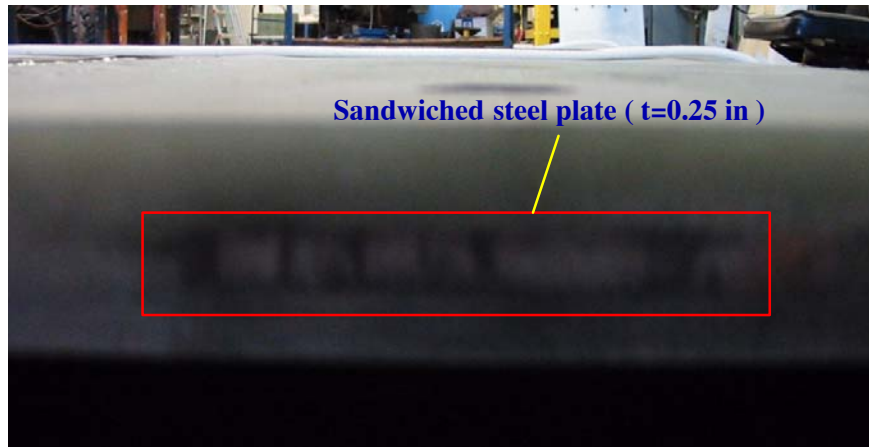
Sandwiched Steel Plate in the Outer Damping Panel Laminate
